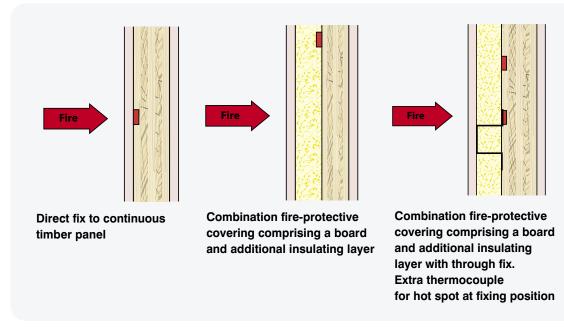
Modified RISF thermocouple positions for typical specimen configurations.
